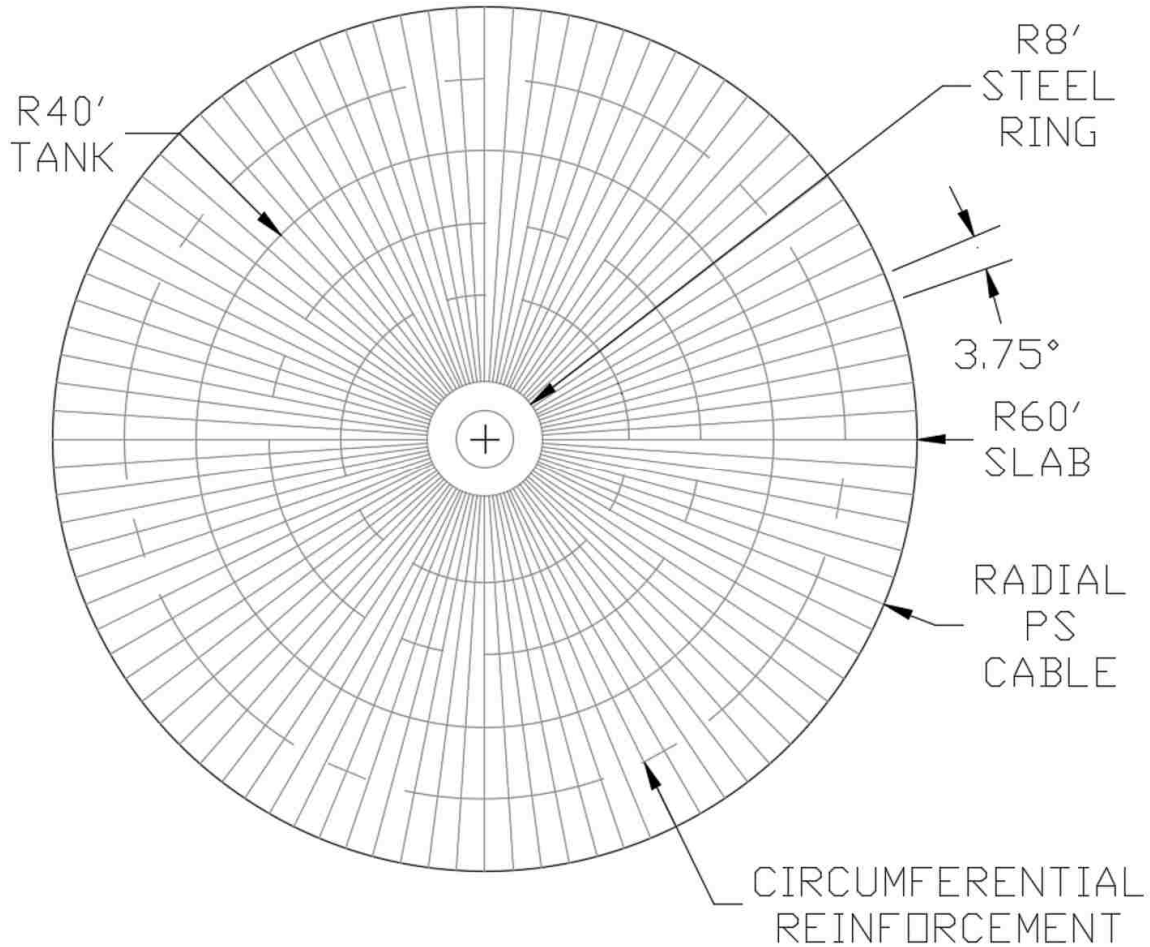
Posttensioning Cable and Circumferential Reinforcement Layout for the Circular Concrete Slab Including Inner Steel Ring
